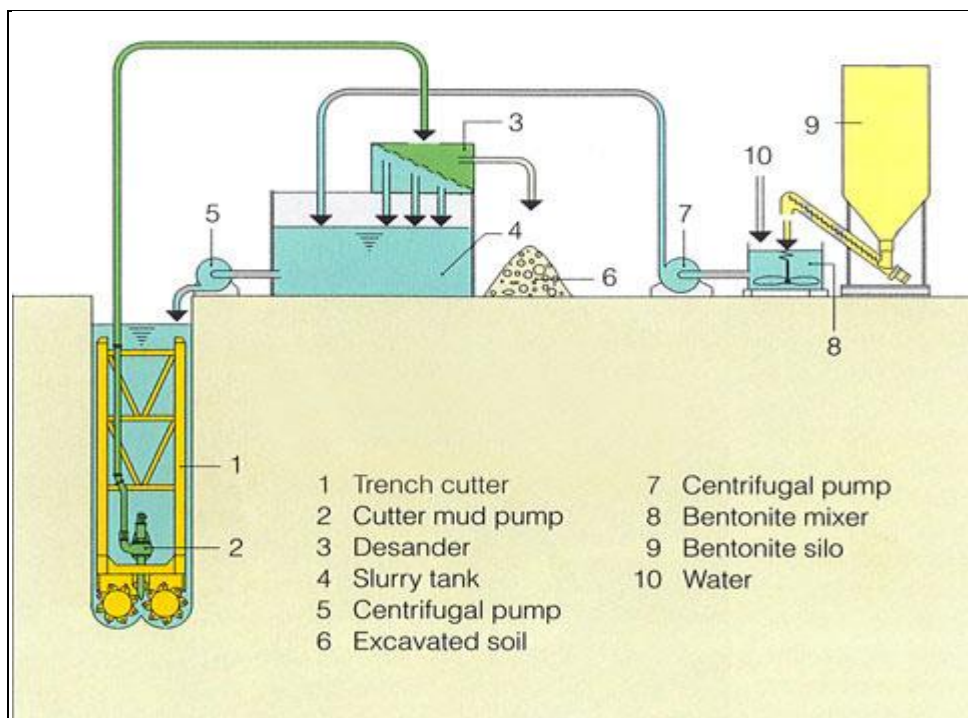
Slurry and cut mud flow sequence in diaphragm wall construction [15]
